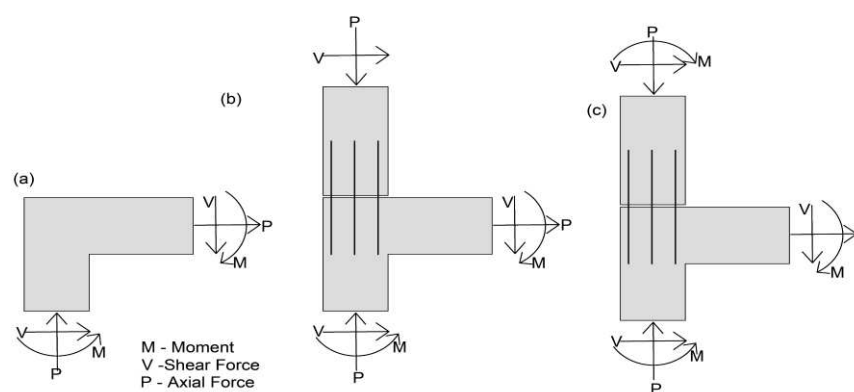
Column knee joint: (a) existing joint, (b) pinned connection, (c) rigid connection.
